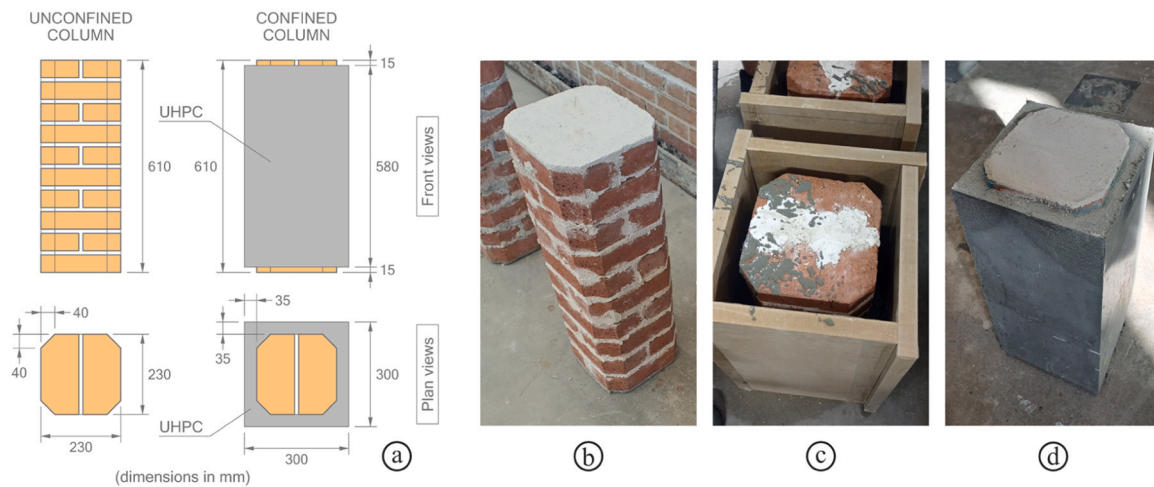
Column manufacturing: (a) plan and front schemes; (b) unconfined column; (c) detail of mould arrangement; (d) UHPC confined column.
